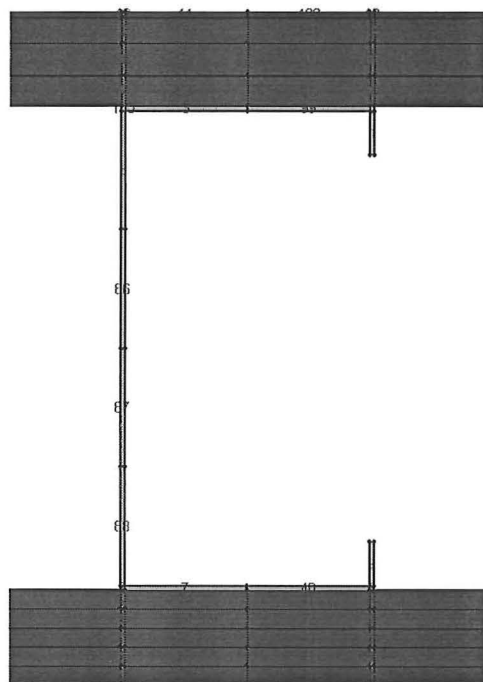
Close-up of gypsum board/steel stud assembly.
